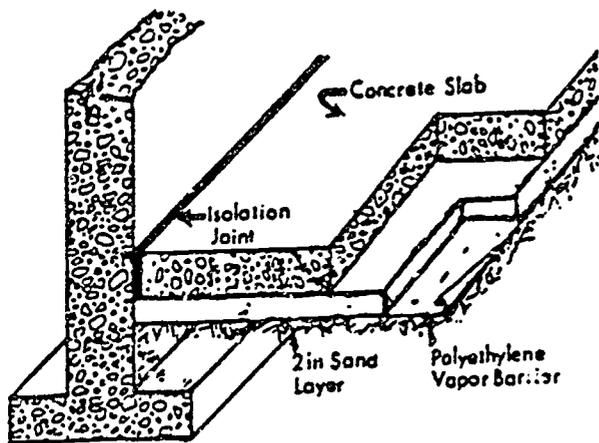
Section through a floor placed on a sand layer with a vapor barrier.
